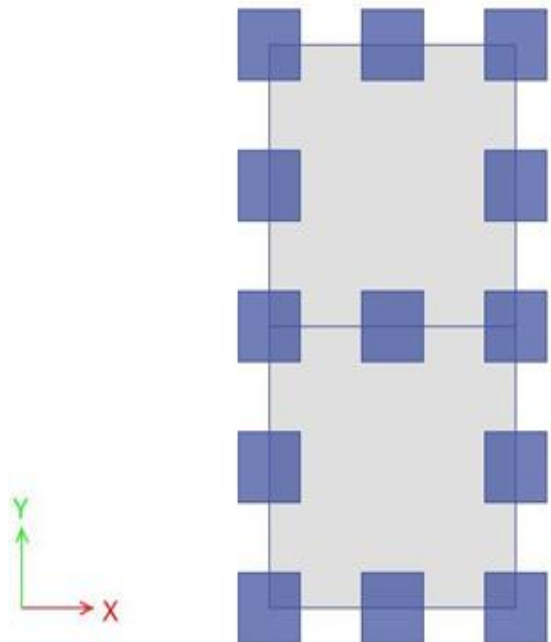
Plan of a bundled tube structure (Floors 1-30)
